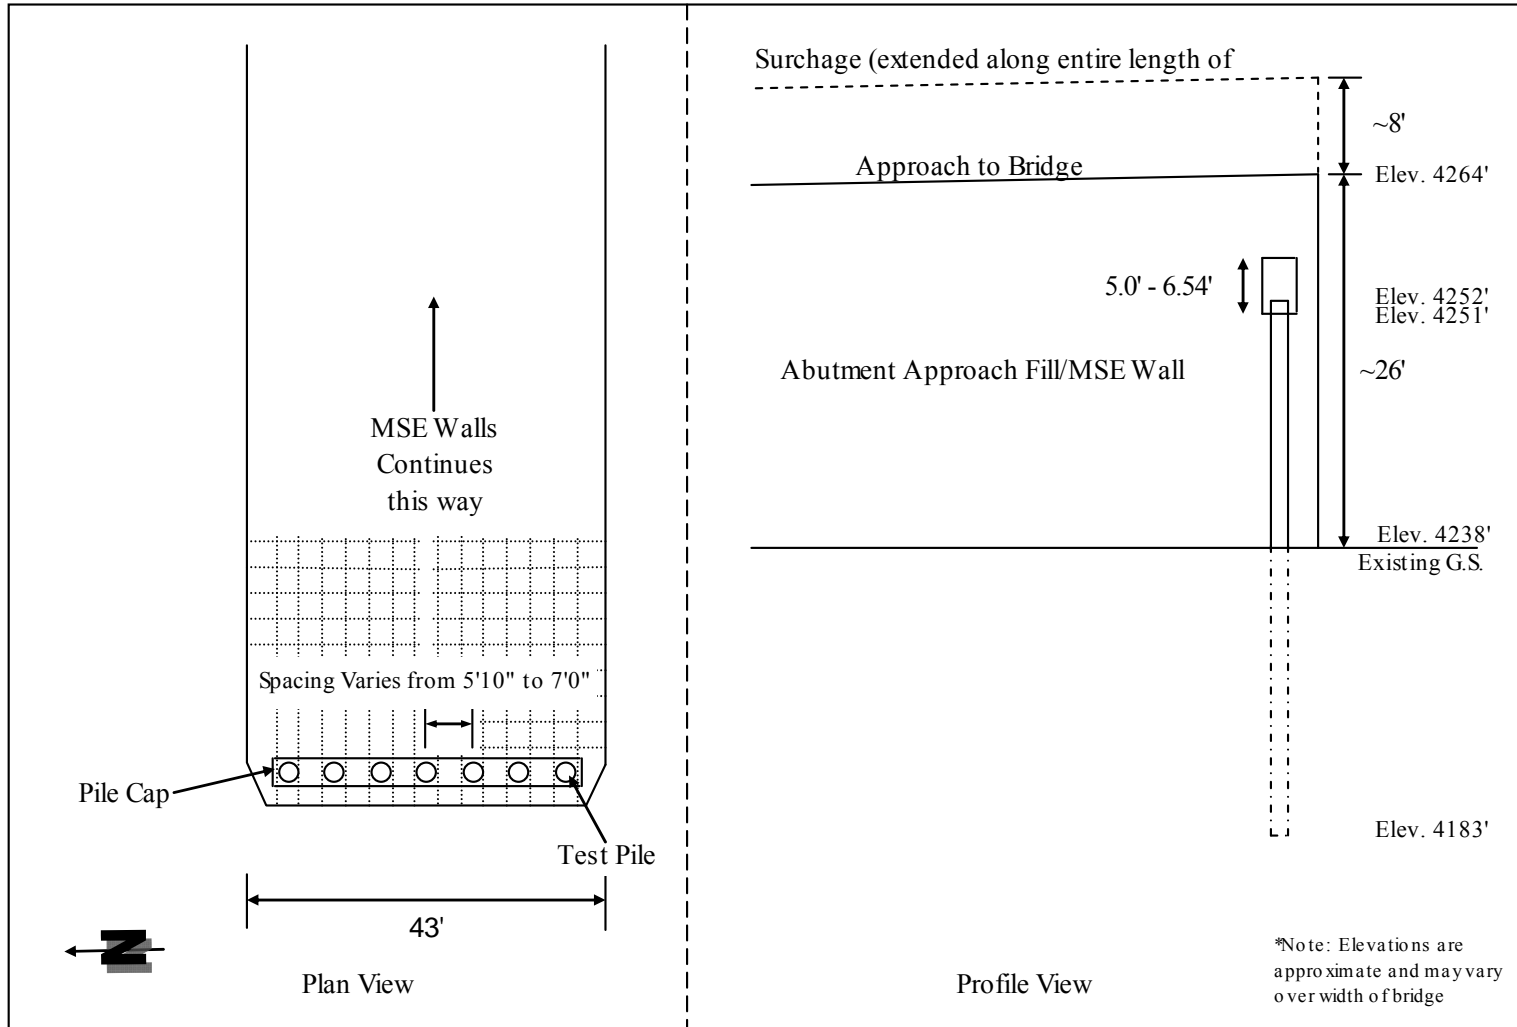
Schematic of East Abutment and Approach Fill at Redwood Road and SR-201 Site
